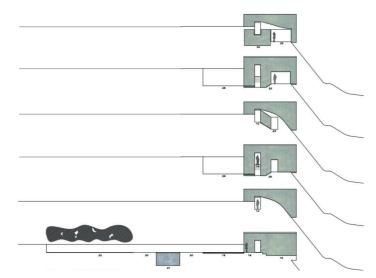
Sections through passages, Horizon house, RCR architects (2007) • Source: El Croquis
